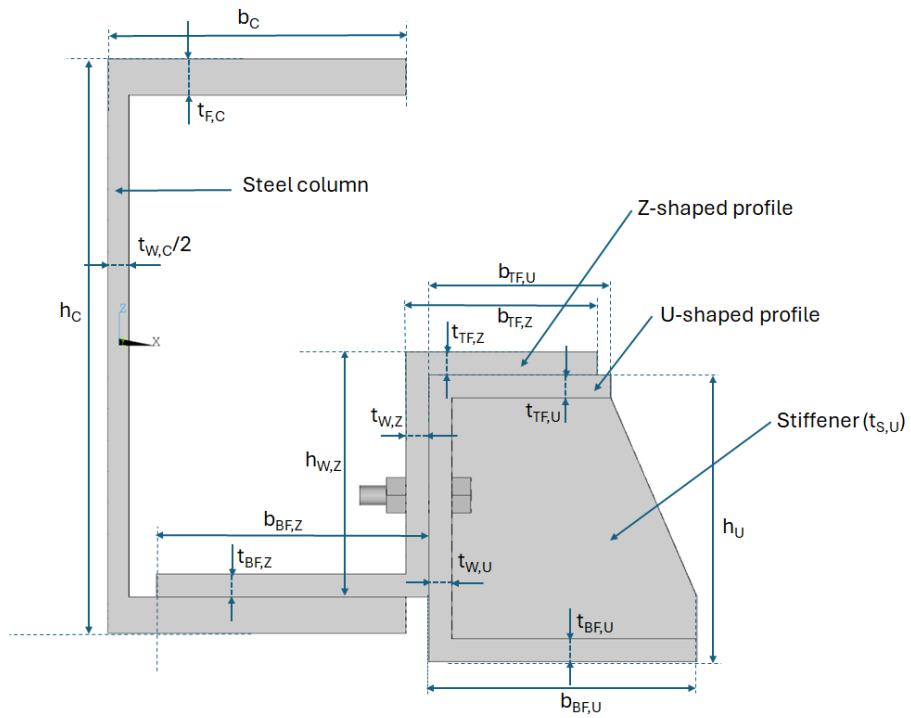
Definition of geometrical dimensions for the fusible link n°2
